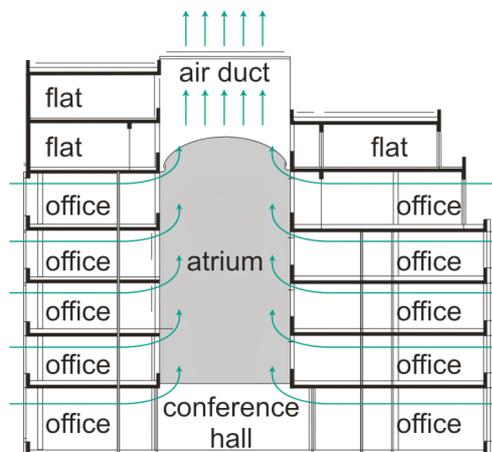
Cross section of the KfW building with the central atrium, showing air flow pathway during night ventilation
